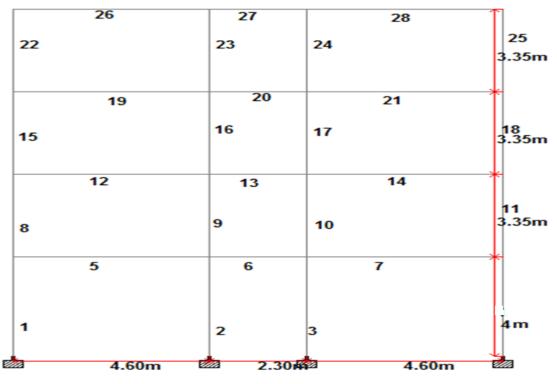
Frame of RC (G+3) building with Dimensioning and numbering
